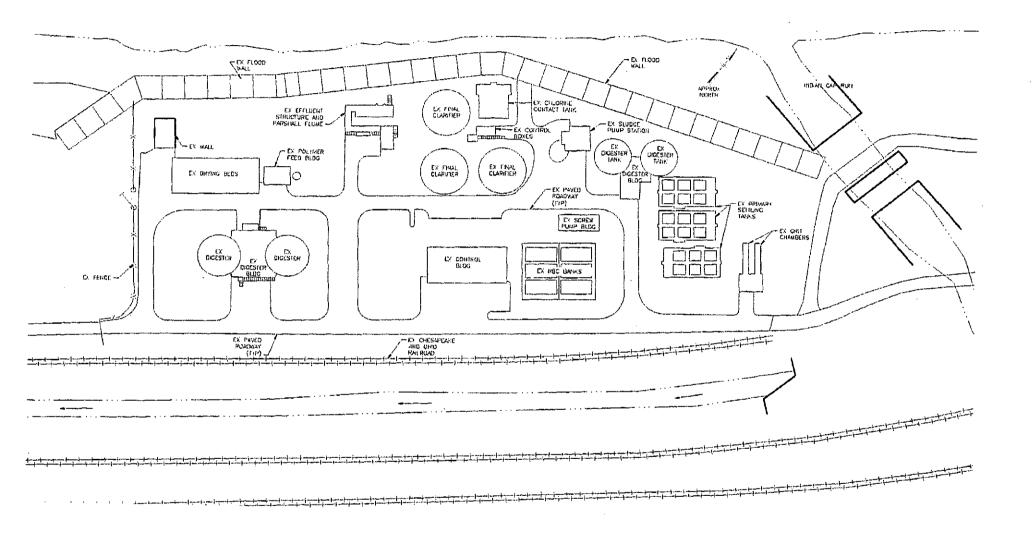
Buena Vista Wastewater Treatment Plant Site Plan
